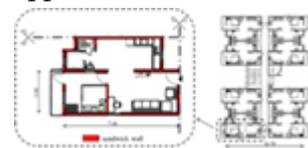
Typical apartment and typical floor of the residential buildings designed in Mumbai
